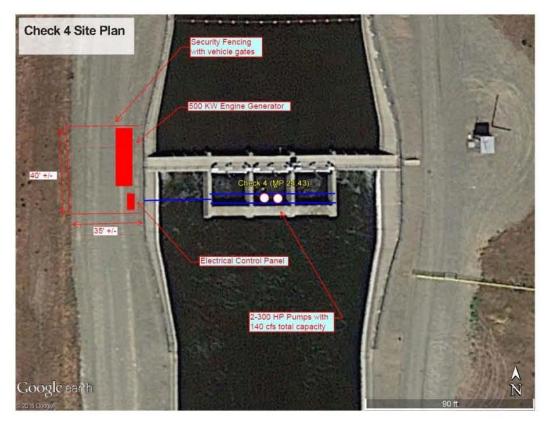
Site Plan for Temporary Lift Station at Check Structure No. 4
